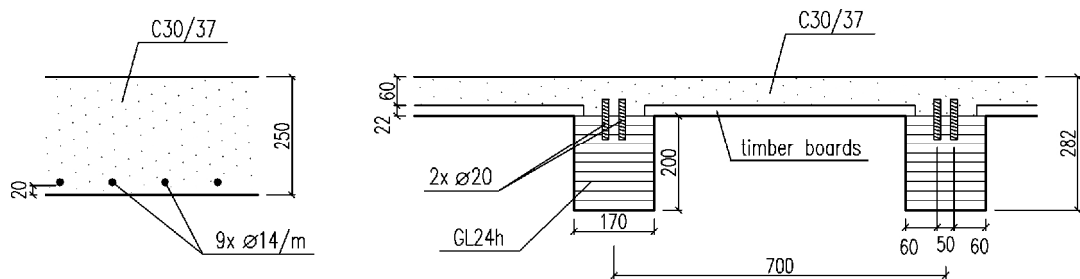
Cross-section of RC floor (left) and timber-concrete composite floor (right)
